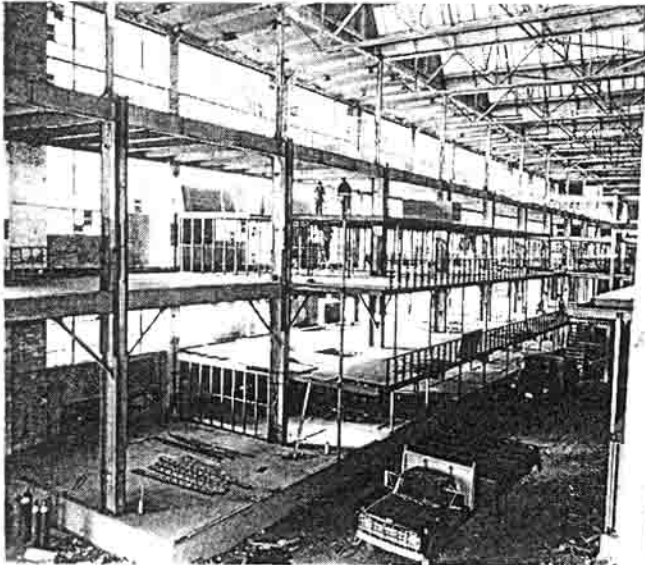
Constitution Quarters during construction showing cantilevered grade beams and corridor trunks.
